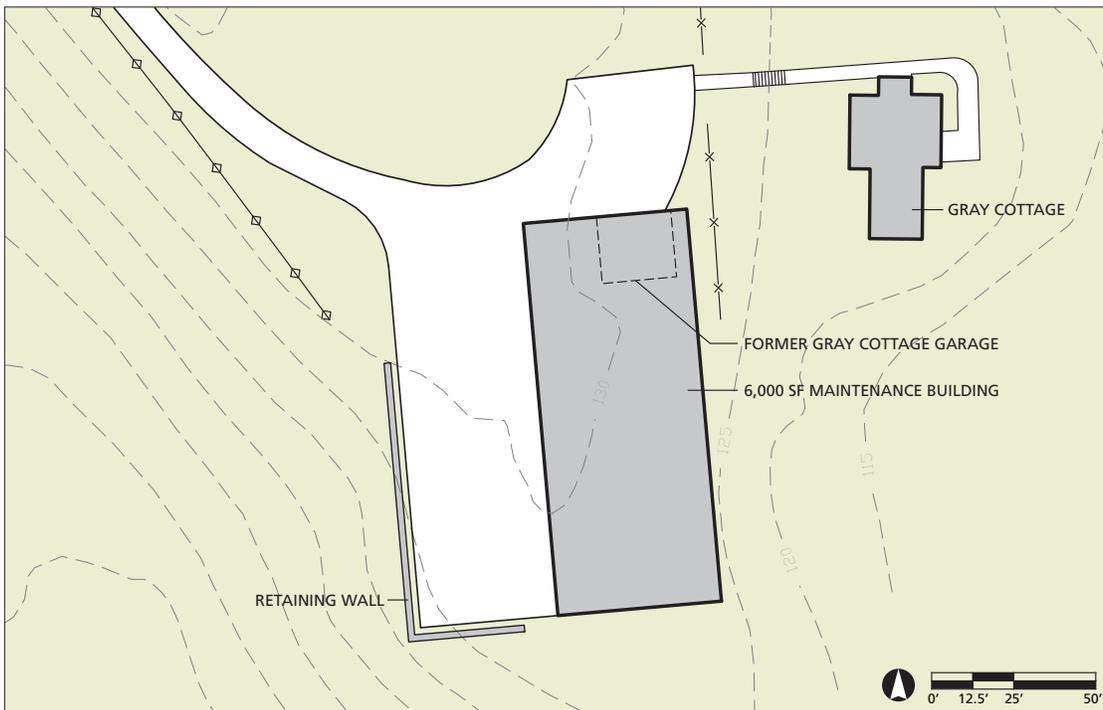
Diagrammatic plan of the proposed maintenance building. To minimize views of the proposed 6,000 square foot building, the long axis of the building should be oriented in a roughly north-south direction (Olmsted Center, 2009).
